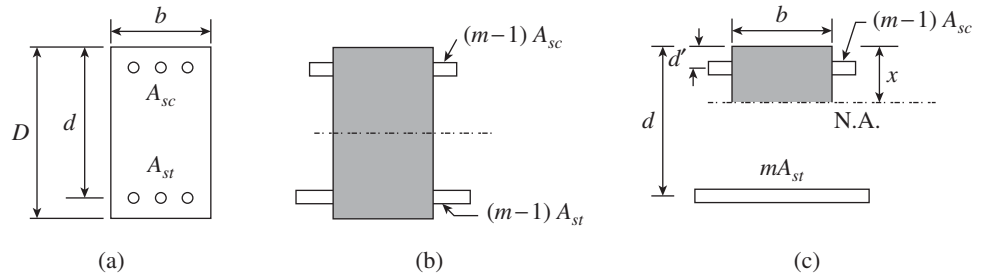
Transformed sections (a) Cross section (b) Uncracked transformed section (c) Cracked transformed section
